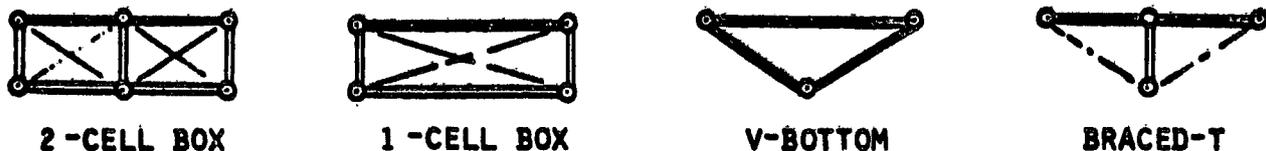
Truss Cross-Section Concepts
